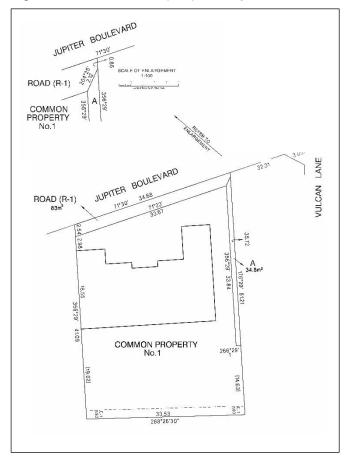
Plan C - Road (R-1) 72.4m2 part of Lot 1 PS 908444B
